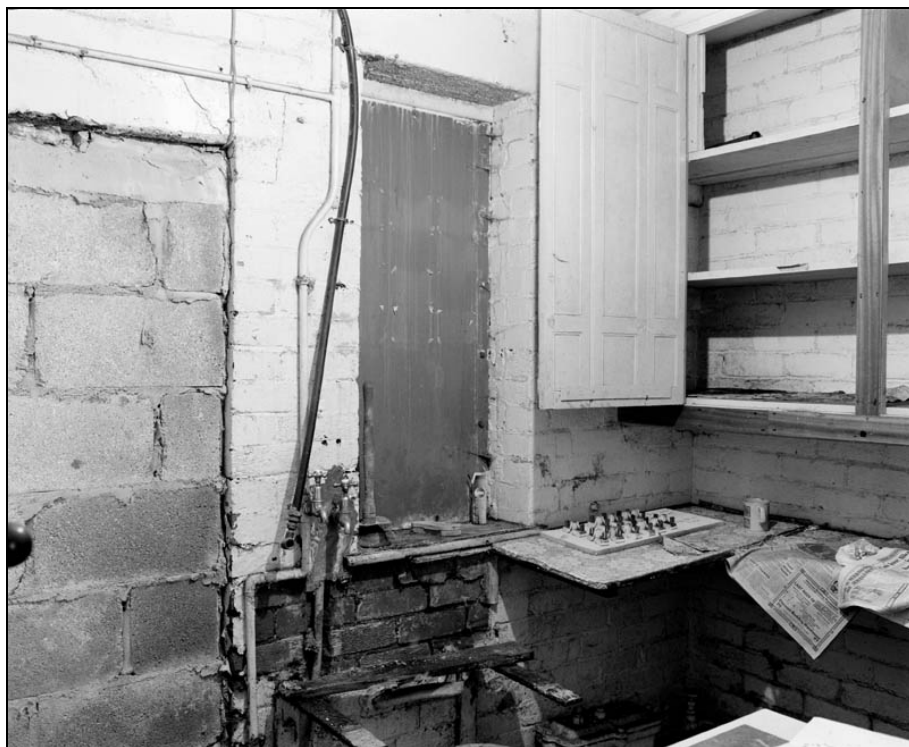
General view of kitchen room G7, looking northwest. Note blocked openings into western extension to building 4 (film 21:5)
